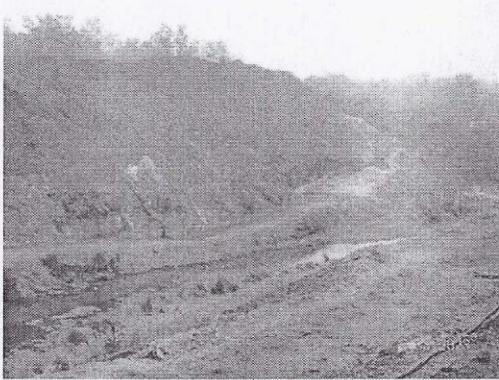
& 34: Photo of wall under construction and spillage of coal over old wall adjacent to river .
